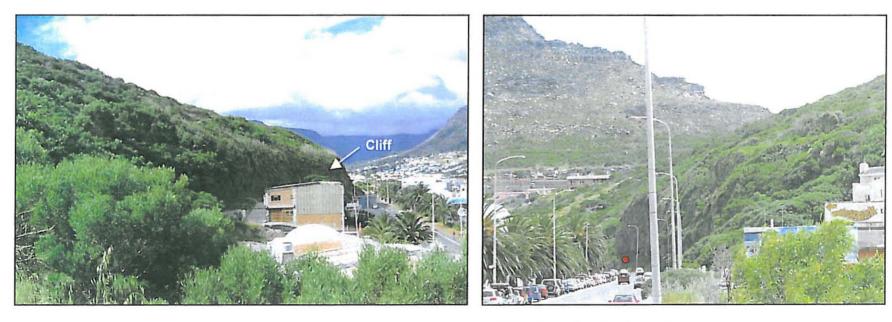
(left) View towards the northeast across the slope. The development would be situated on the slope above the structures in picture.
